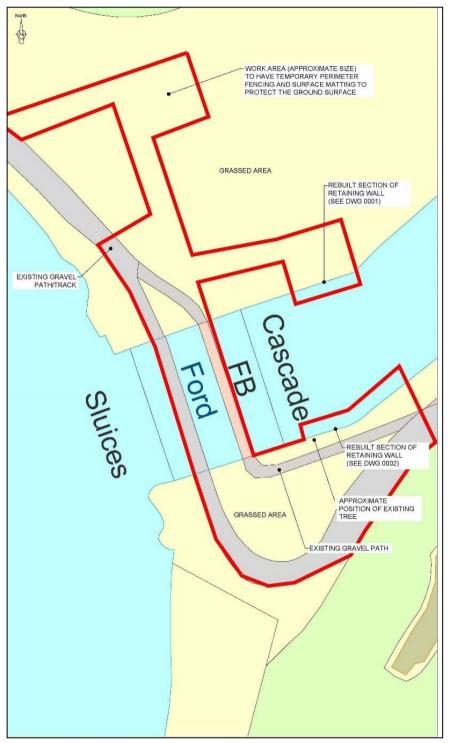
Detailed site location (nb no intrusive works took place on the south bank).
